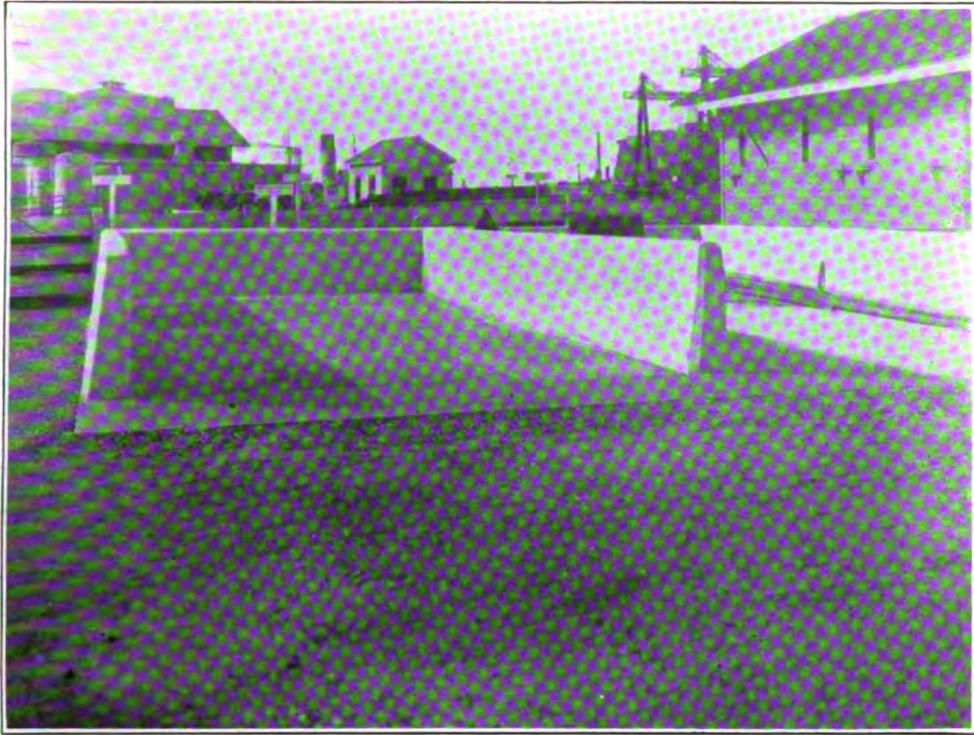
Type of concrete scrap bins provided for all scrap material, arranged in pairs and used alternately.
